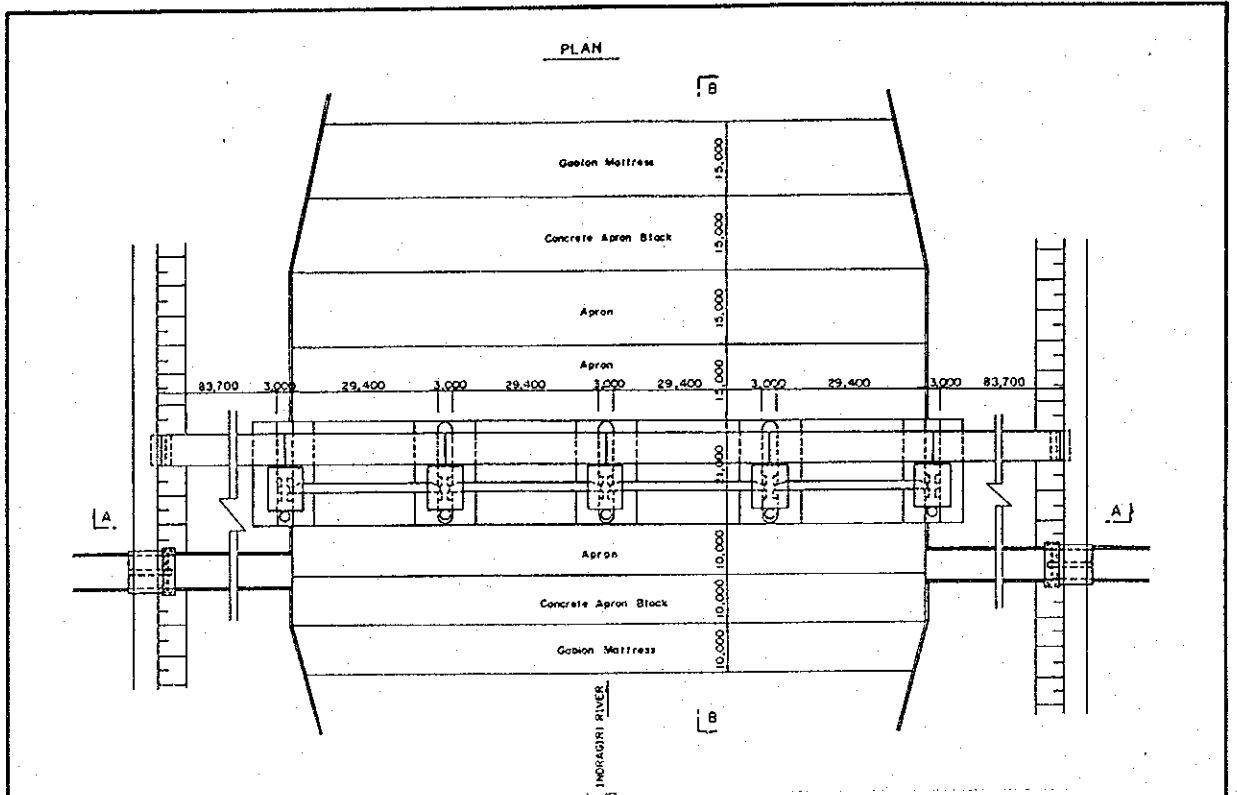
TYPICAL SECTION OF PROPOSED
